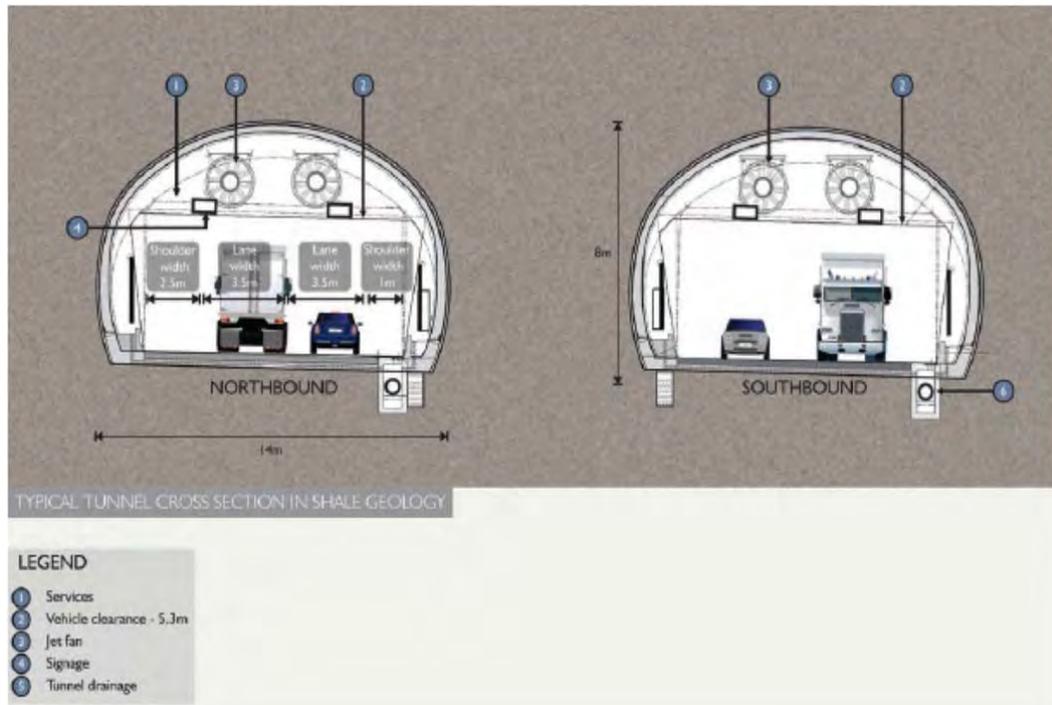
Indicative cross-section of the main alignment tunnels (source: EIS)
